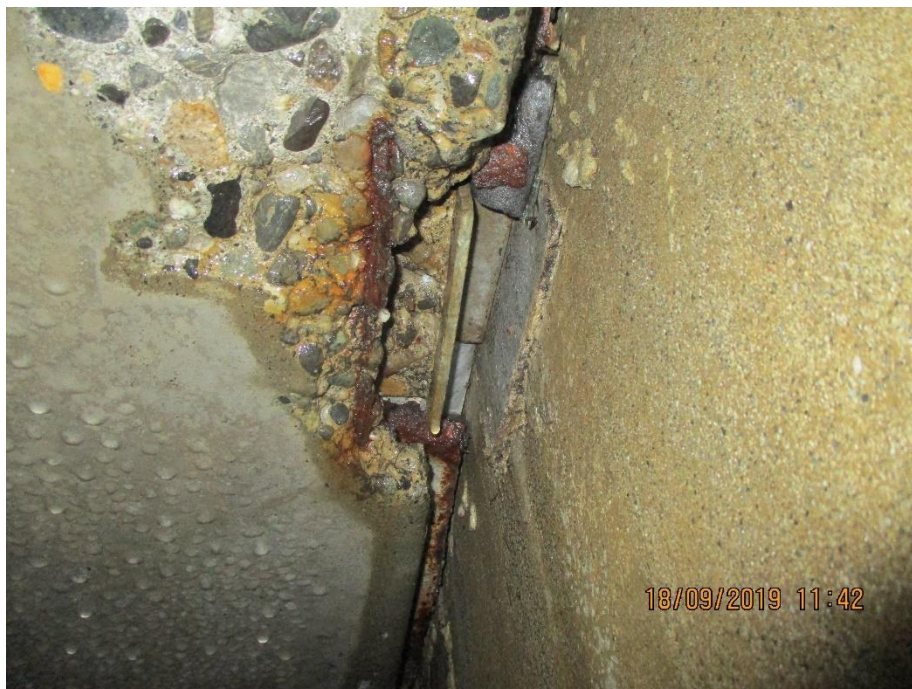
Corroded double-tee joist connector at "non-bearing" exterior wall support
